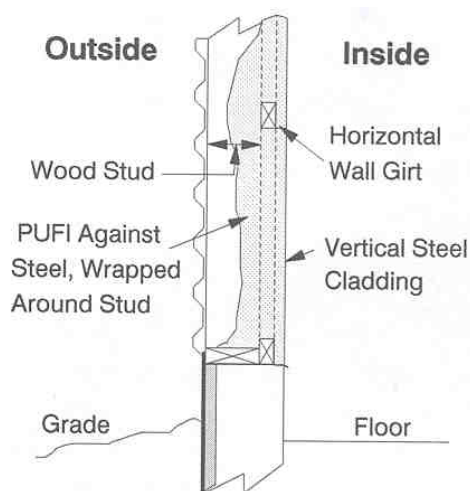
Soldering work was being done 30 cm off the ground on the outside of the cold storage against the stud wall similar to the cross section above.
